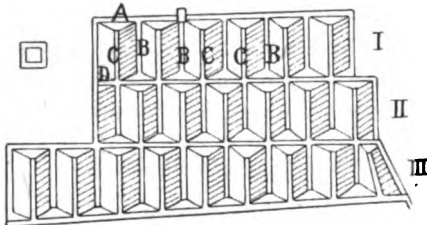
Ridge and Furrow Irrigation. Plan.
